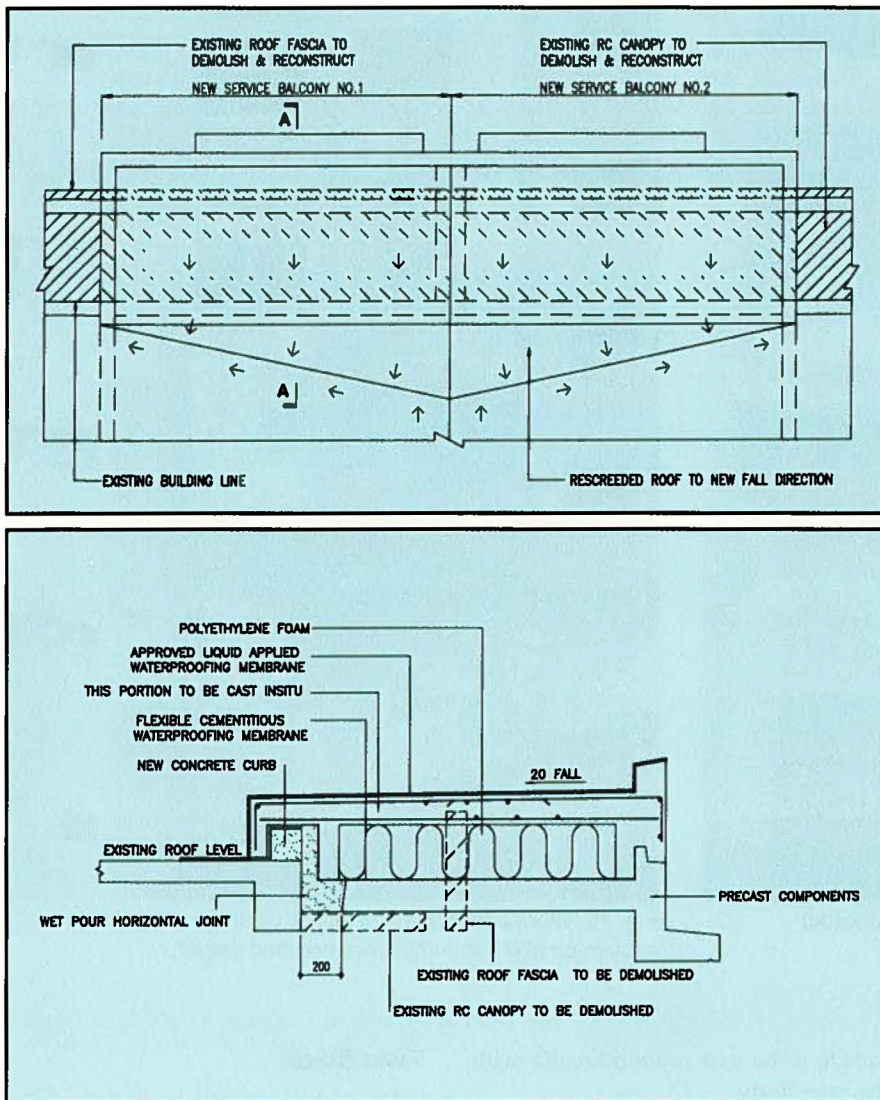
Roof plan and section illustrating the interfacing of new twin added space structure with existing building roof.
